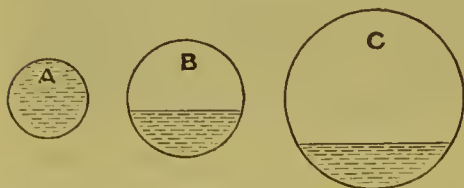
A, Section of Four-inch Pipe running full. B, Section of Six-inch Pipe, and C, Section of Nine-inch Pipe, with the same quantity of Water running through them that suffices to fill the Four-inch Pipe.
